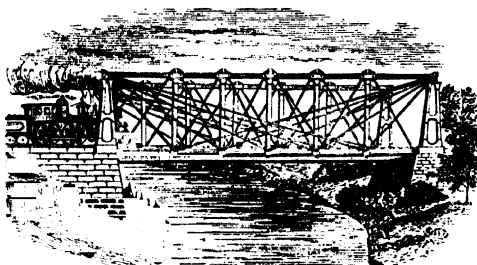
Early Bollman Truss (from Mahan's "Civil Engineering").
